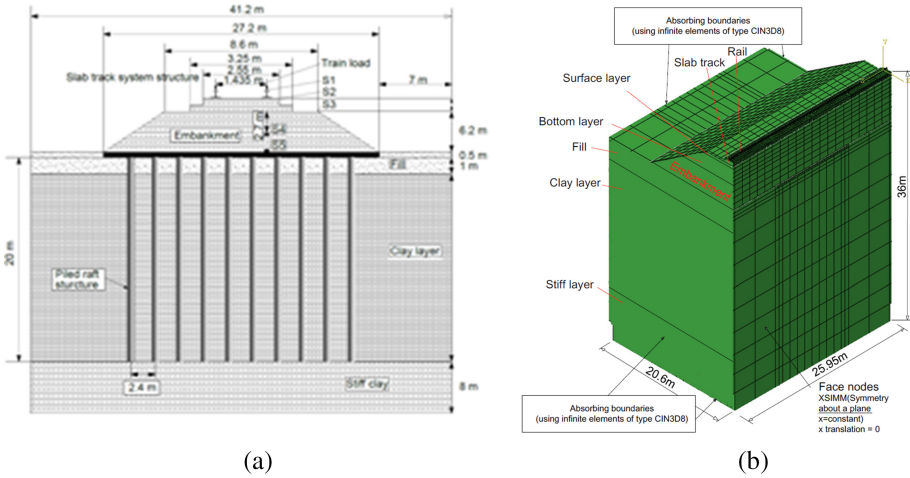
Model details: (a) Schematic cross-sectional layout of a typical High-speed railroad ballastless track over piled raft embankment and (b) Illustration of the geometry of the developed 3d finite element model
